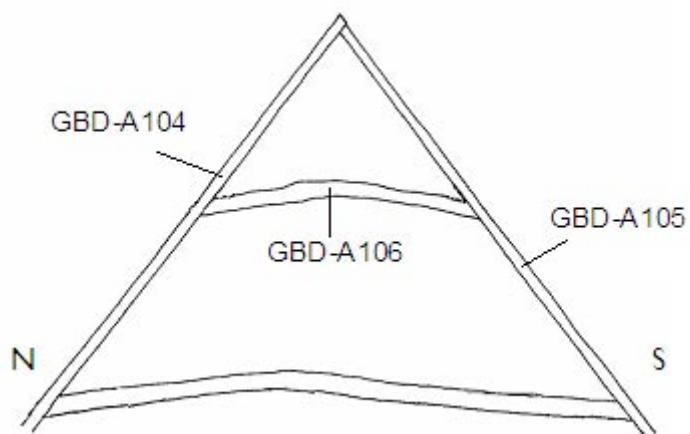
Stable; sketch of truss 2, showing the location of samples GBD-A104–6
